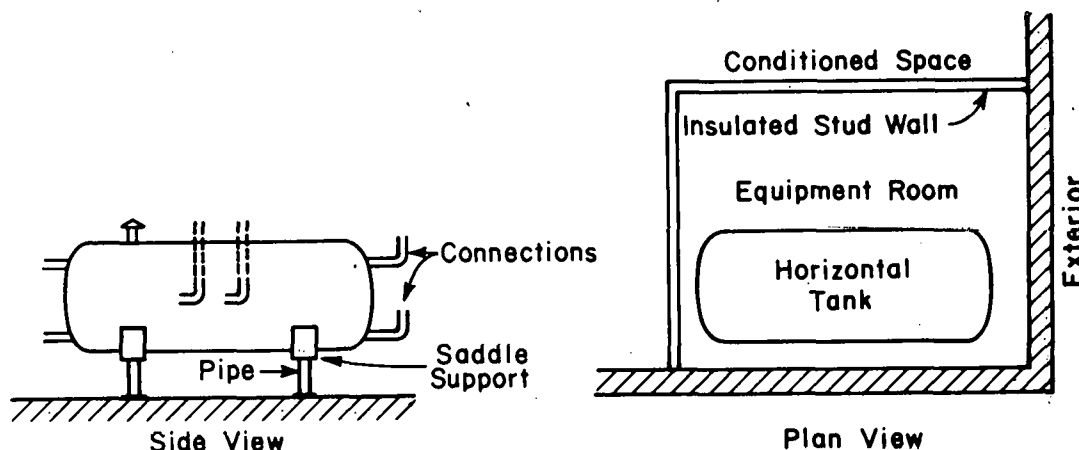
Installation and Insulation of a Thermal Storage Tank [92]
